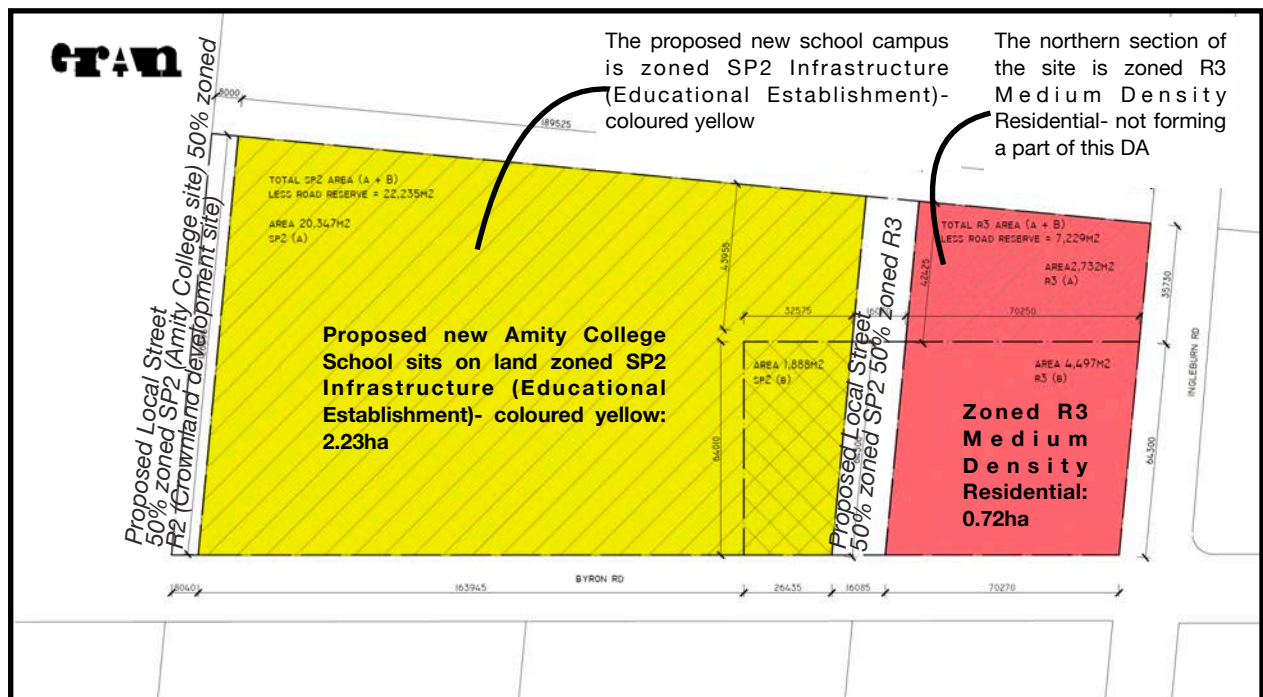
The Project Site & Leppington Precinct Indicative Layout Plan
